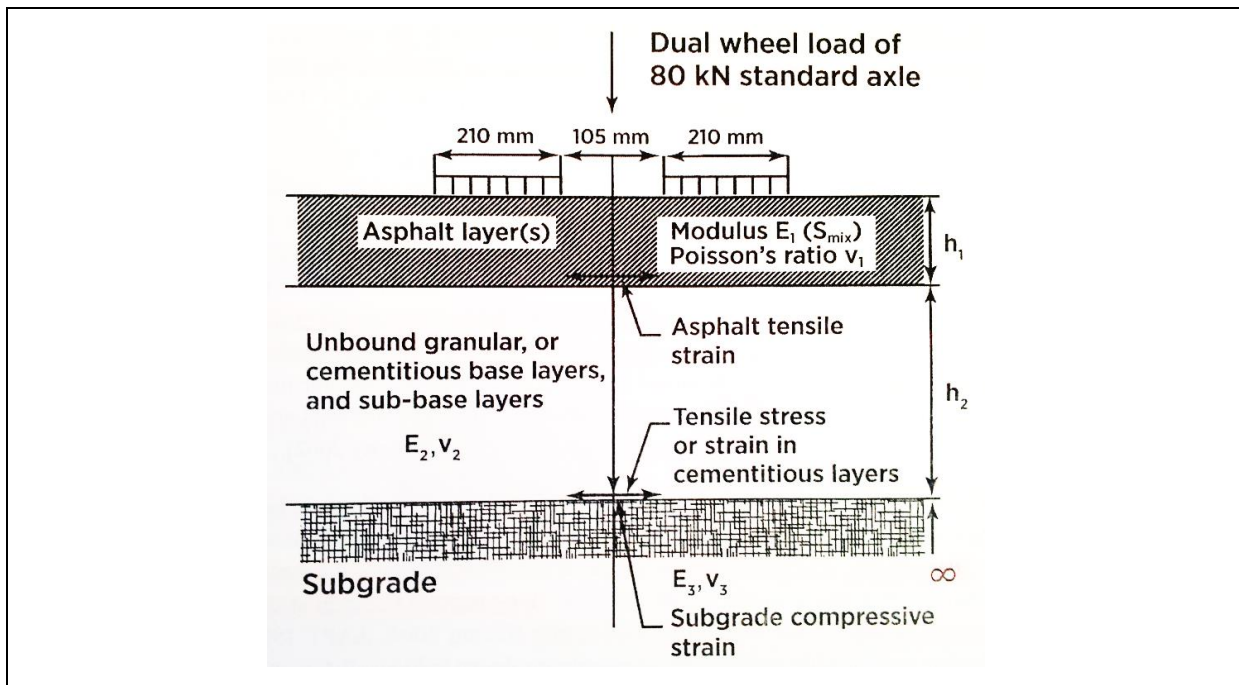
Principle of Empirical Pavement Design (Dore & Zubeck, 2009)
